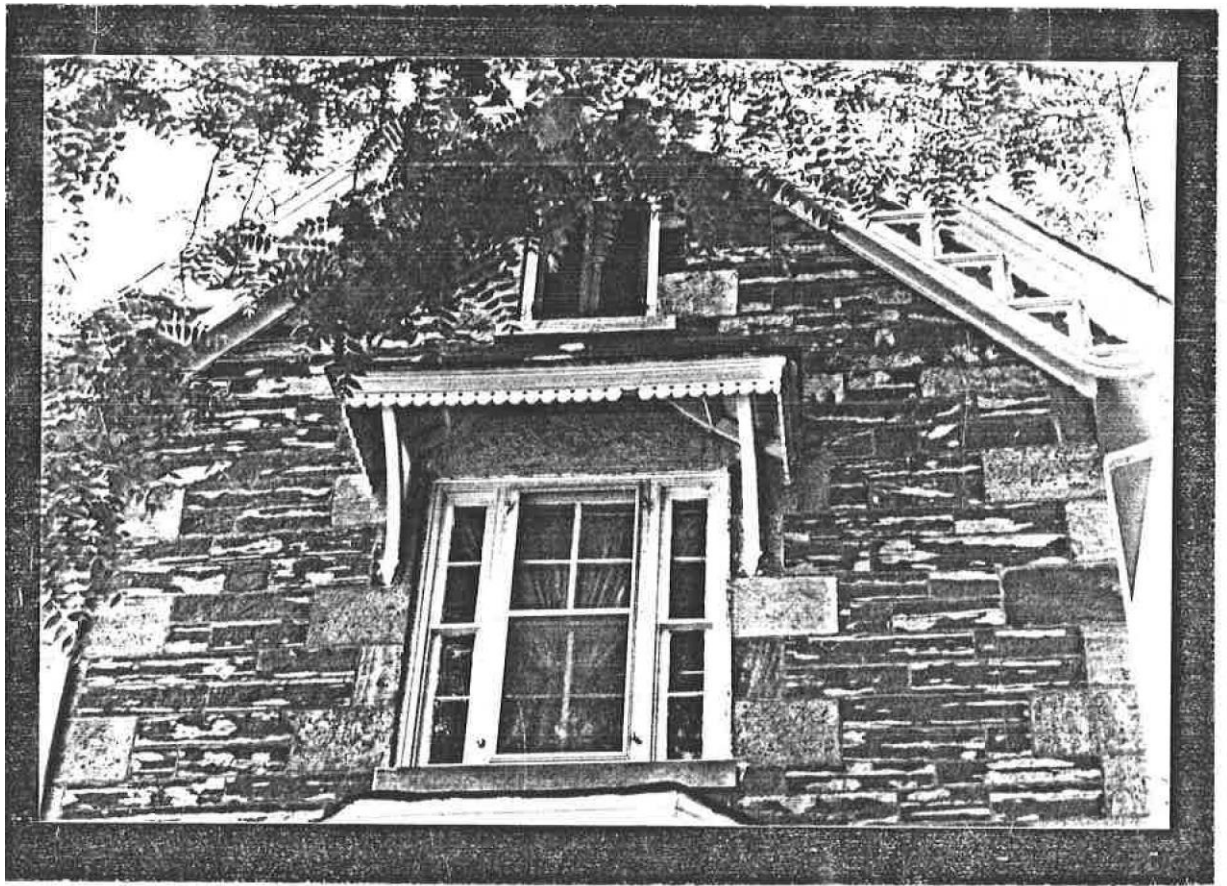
NORTH SIDE GABLED END DETAILING THE UPPER STOREY WINDOW AND BRACKETED HOOD
